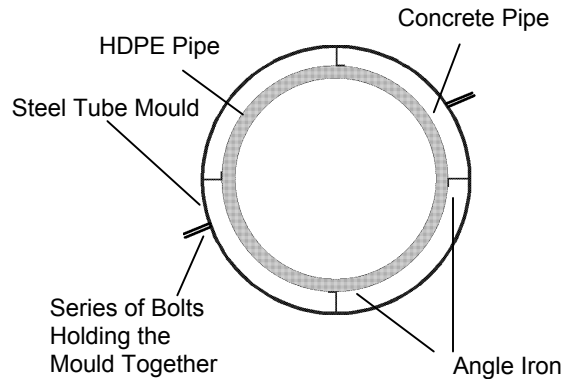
Configuration for Concrete Pipe Casting (Horizontal Section through Vertically Oriented Pipe)
